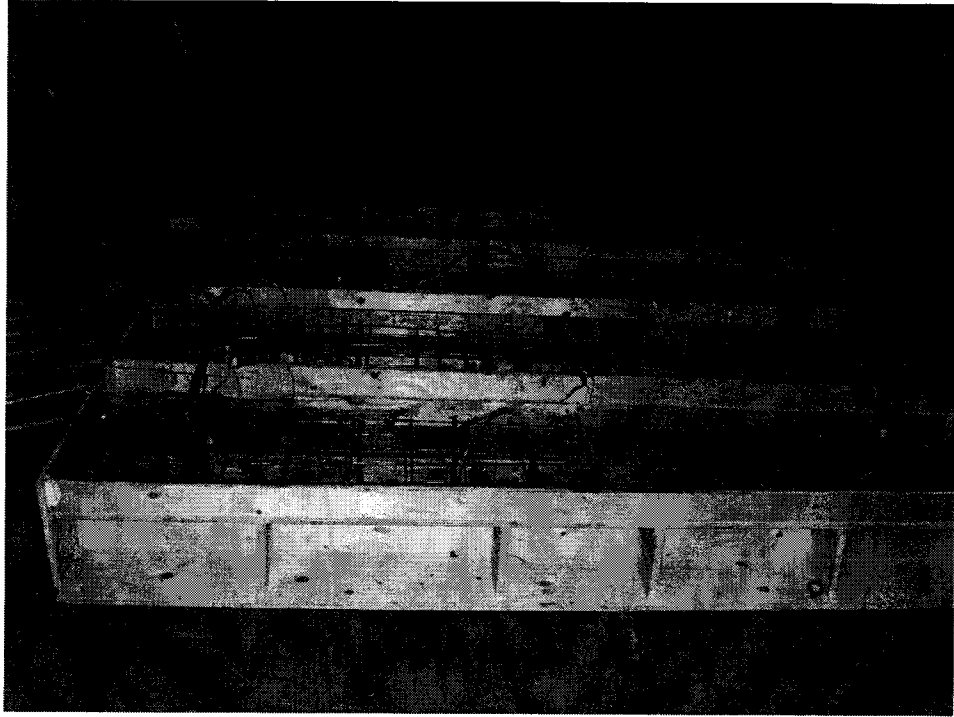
Wooden forms and steel cages prior to concrete pouring
